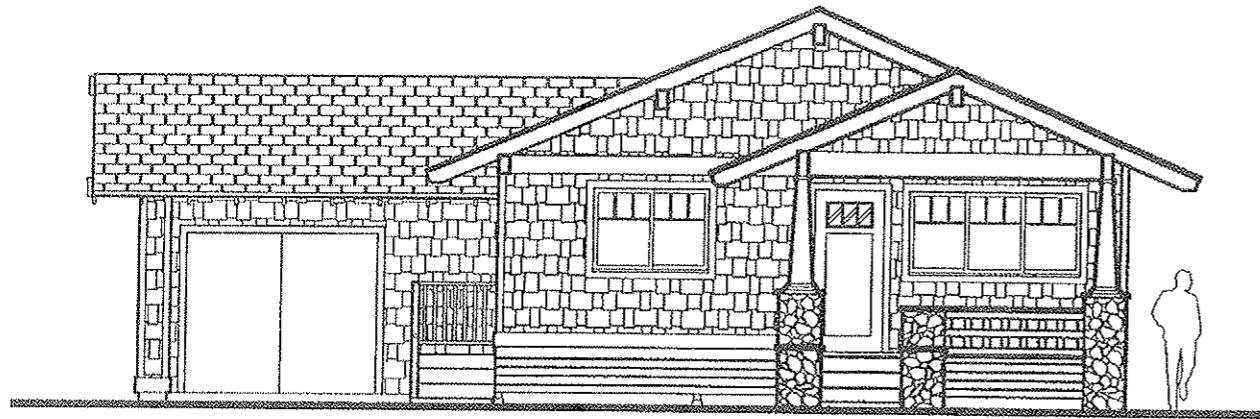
Proposed Kula Ridge Residential Workforce Housing Subdivision House Model C
